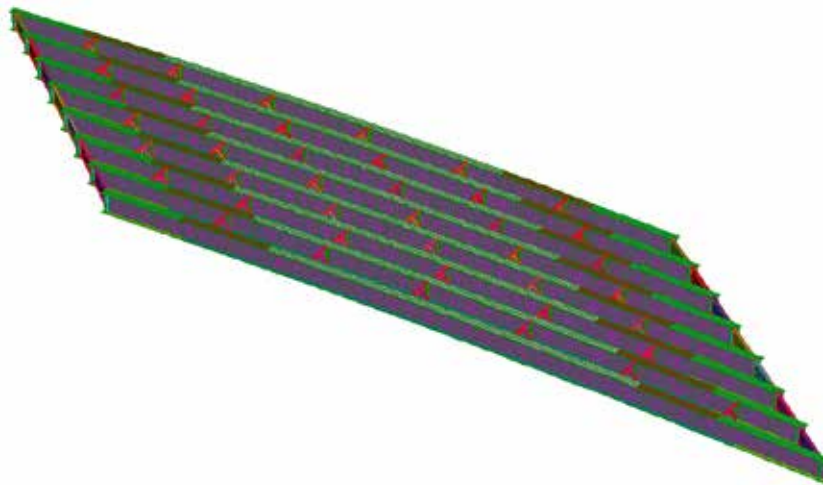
Construction Sequence – Stage 9 – Steel Dead Load
